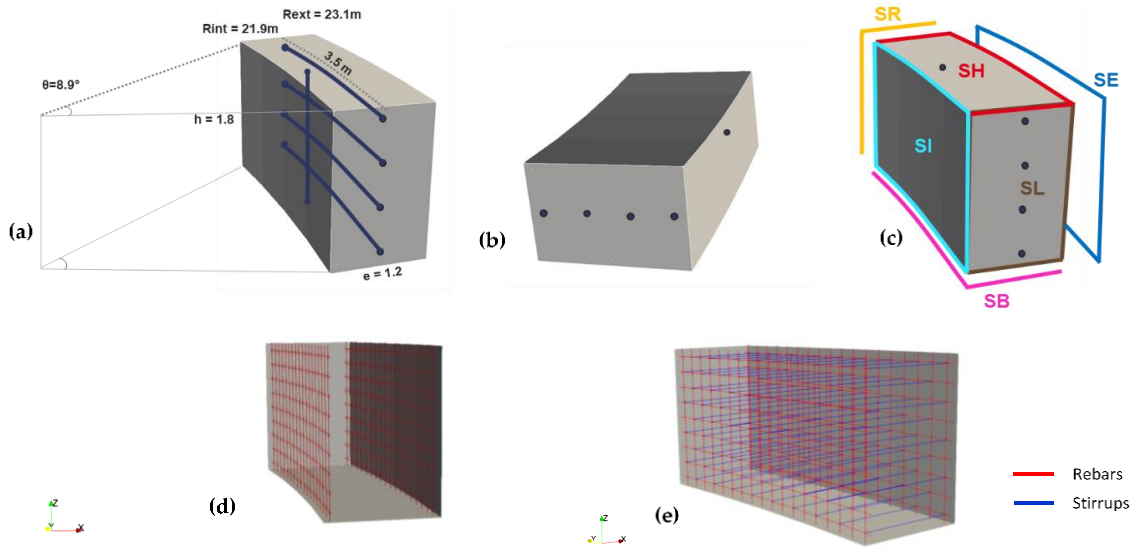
(a): Specimen geometry as part of the containment and cable positioning overview, (b): Specimen orientation in the laboratory, (c): Definition of the six surfaces of the specimen, (d): Inner and outer rebars, (e): Stirrups.
